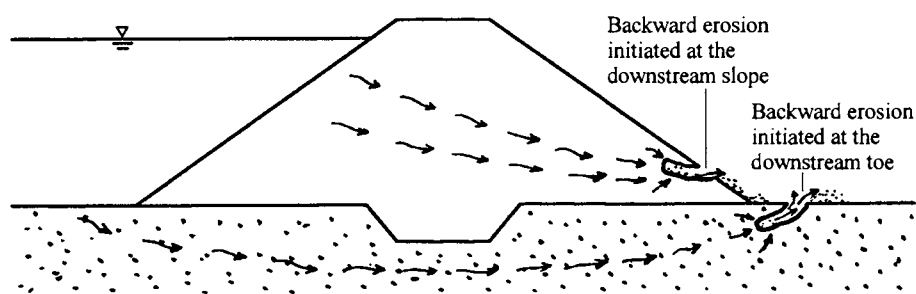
Piping through a concentrated leak within the embankment or in the foundation.
